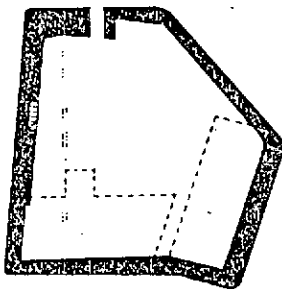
GROUND PLAN OF CASTLE TIORAM.
